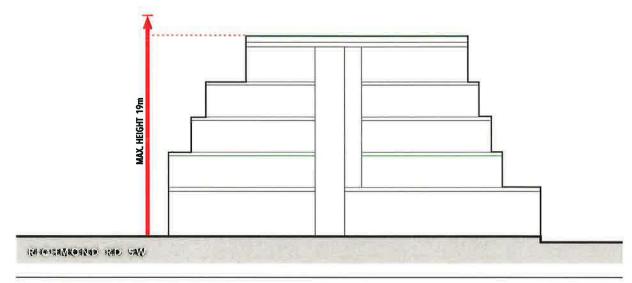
PROPOSED BUILDING HEIGHT MODIFIER
